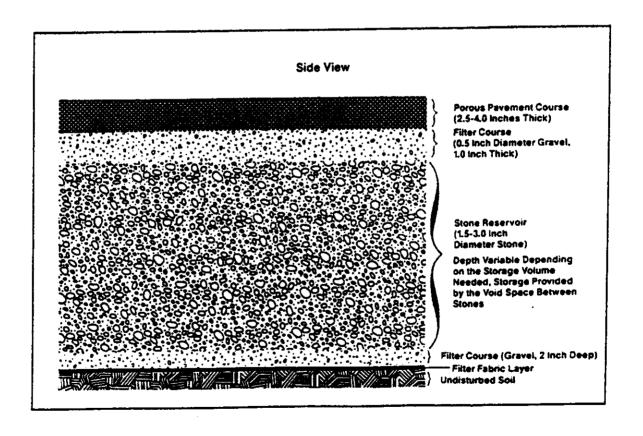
Schematic of Typical Porous Pavement Section (Source: Schueler 1987)
